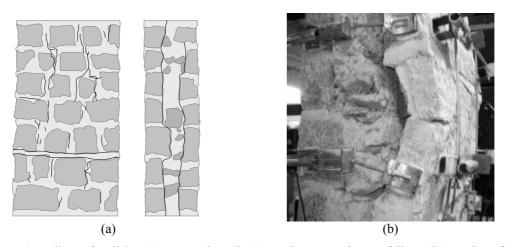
Failure of wall 2W1 (unstrengthened): (a) crack pattern close to failure; (b) rotation of the external leaf.
